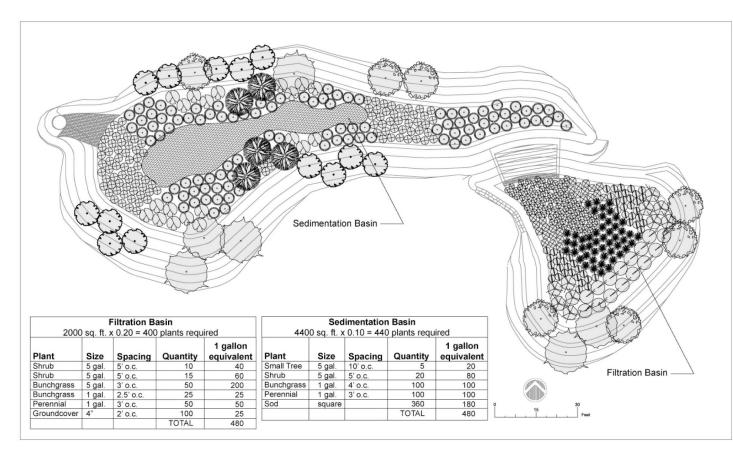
C-4: Example of Biofiltration Landscape Layout and Calculations
